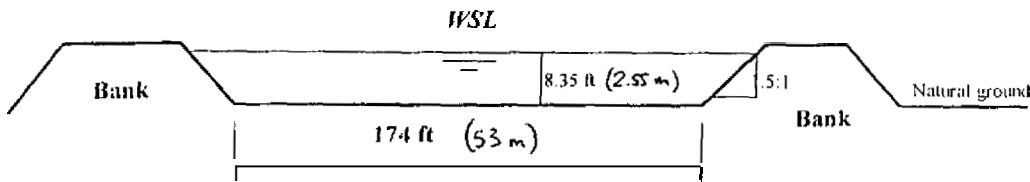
typical cross section of Chashma Right Bank Canal
